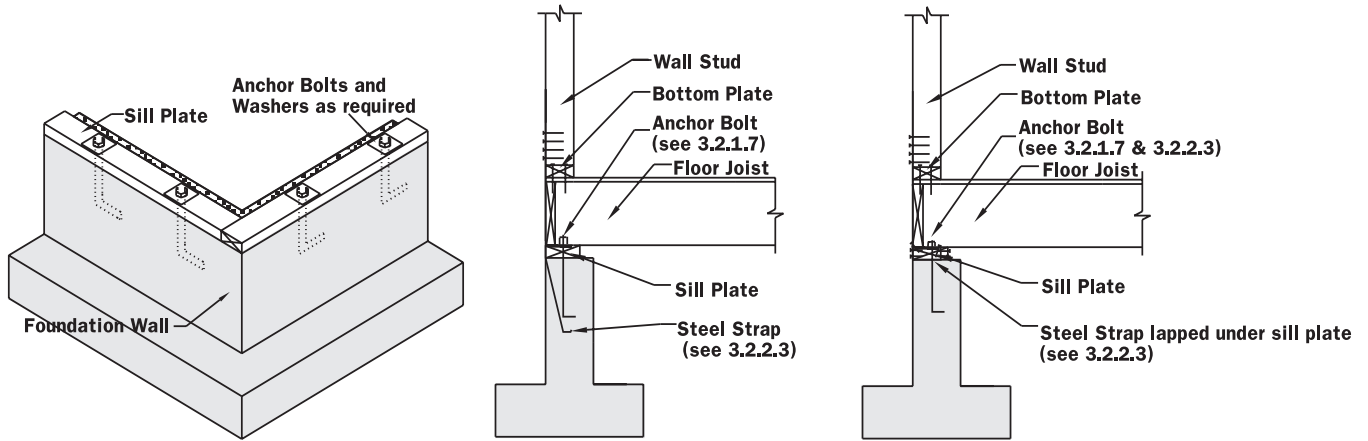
Sill Plate Anchorage to Masonry Foundation Wall
